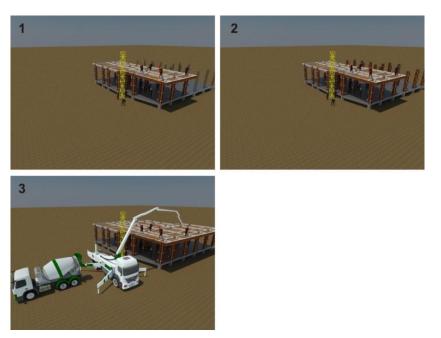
Implementation phase method of casting concrete with Ready mix concrete pump
